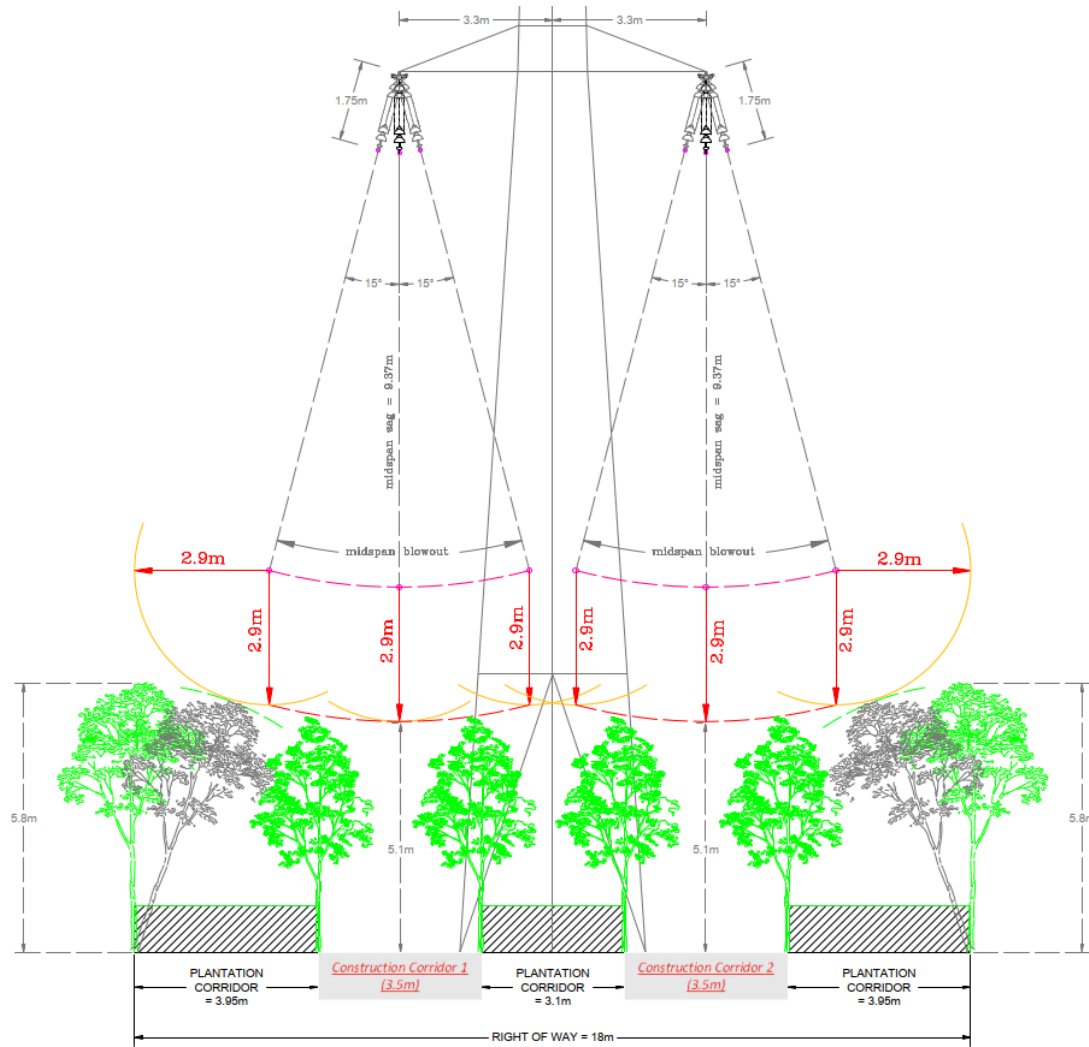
132kV TL Plantation Corridor @18m ROW
